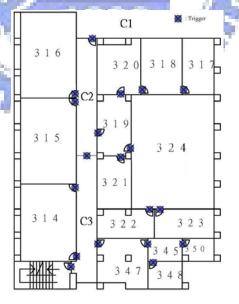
The floor plan at the 3F, Engineering Building III, National Chiao Tung
